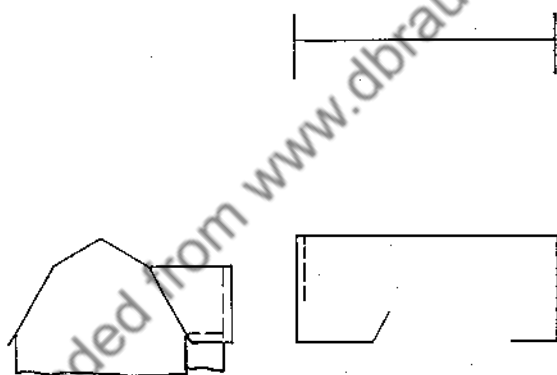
Gambrel Roof for Worksheet No. 11.
